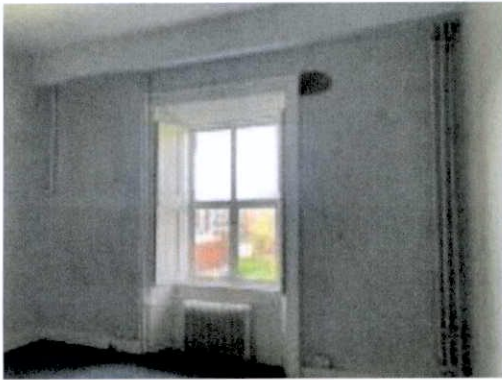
Second floor bedroom. Contemporary uPVC window frame with original timber window boxes.
